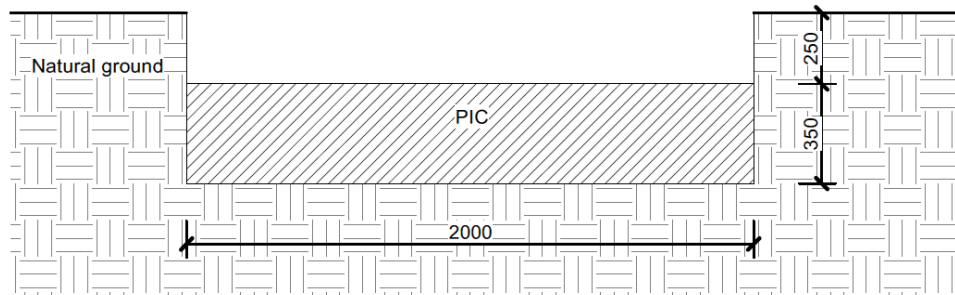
Schematic cross section of the 4m² trial PIC raft constructed for testing of the engineering properties of PIC when utilised as a shallow ground improvement method
